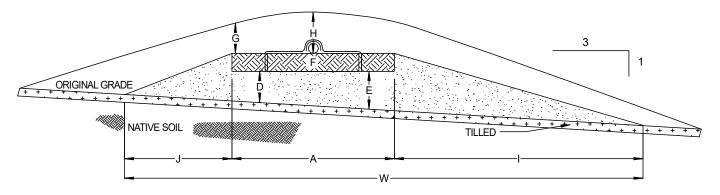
PLAN VIEW - MOUND SYSTEM
